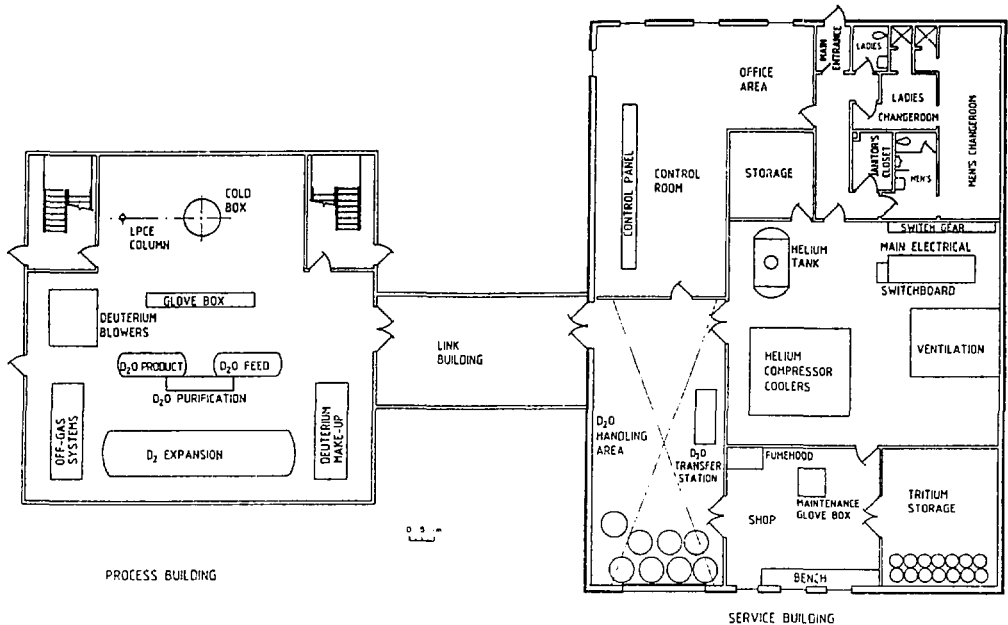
TRITIUM EXTRACTION PLANT FLOOR PLAN
